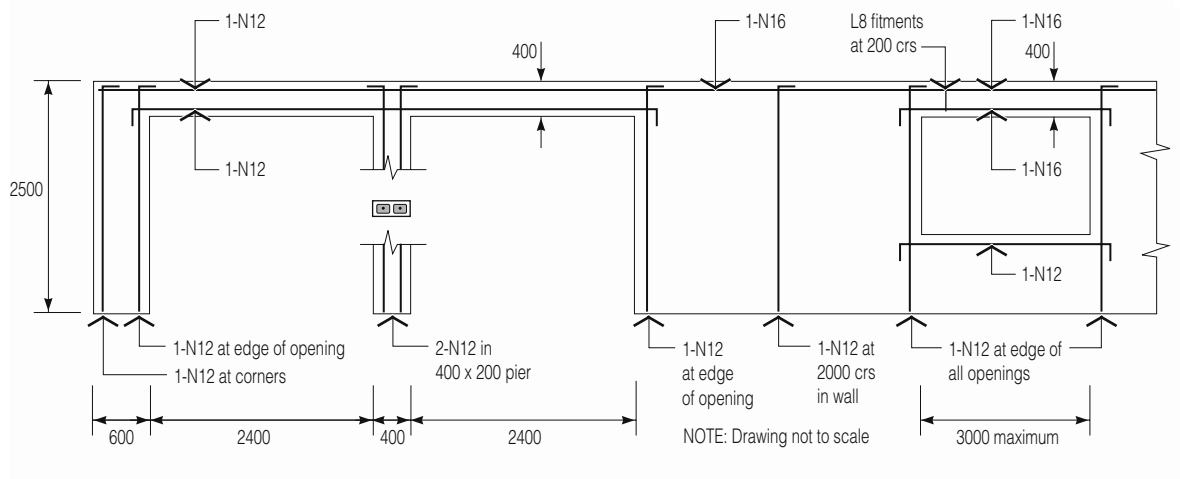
Wall Reinforcement for 190-mm Leaf for Wind Categories N1, N2 and N3 and 2500-mm Wall Height
